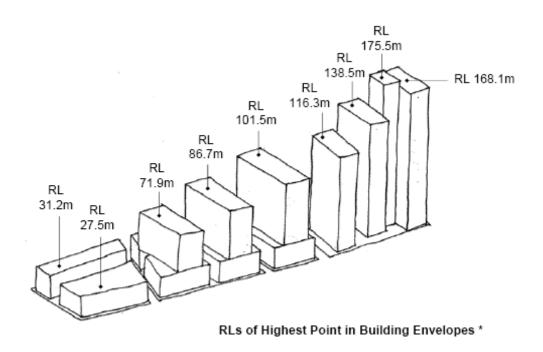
Perspective Sketch of the Potential Tower Component of the Modified Barangaroo Concept Plan (view from the north-west)
